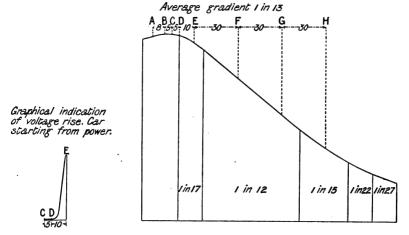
Longitudinal Section of Heavy Gradient for Coasting Tests.
